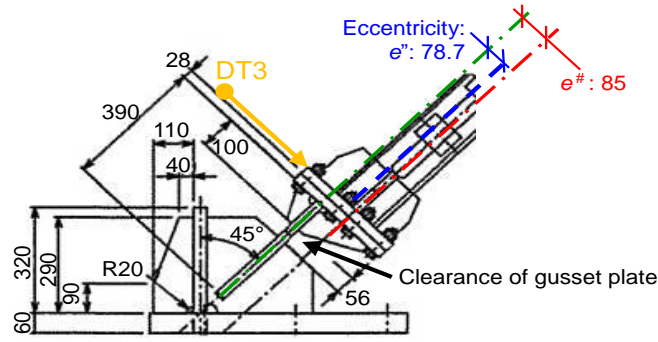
Proposed in-plane gusset-plate connection of Specimen 1 (dimensions in mm)
